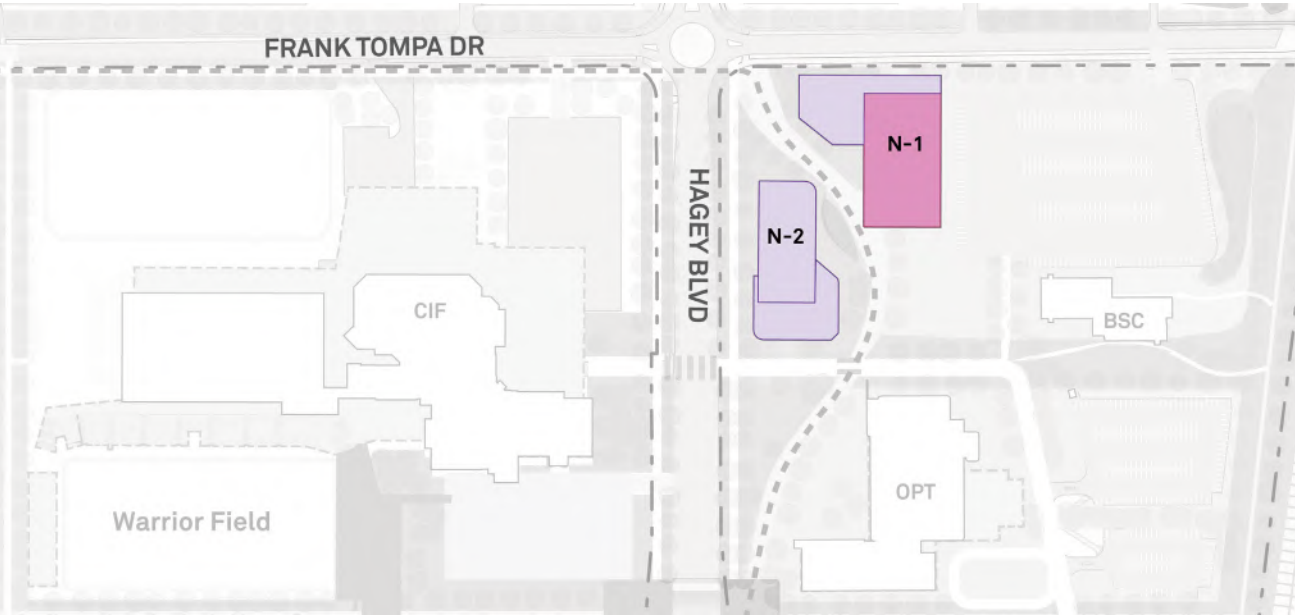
North Campus Site Opportunities Plan. Highlighting key site plan, setbacks, open space and building development opportunities
